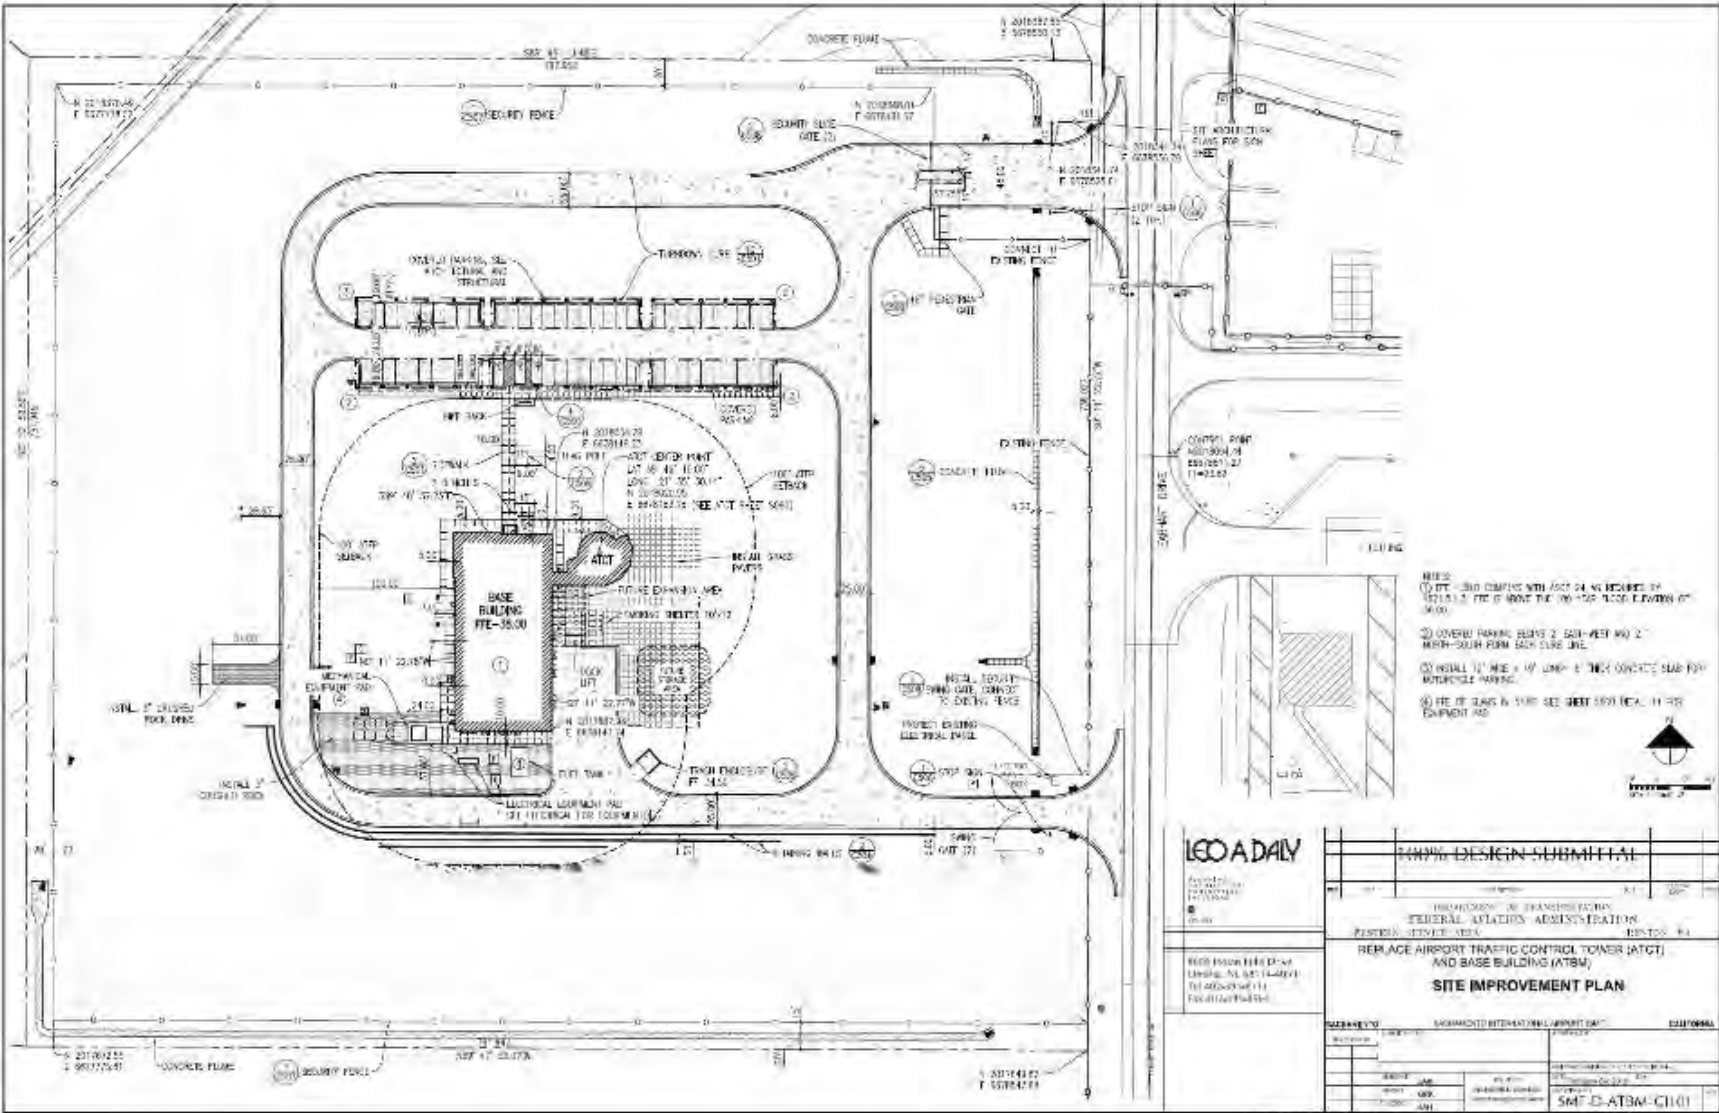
Proposed Layout of Replacement ATCT and Base Building
